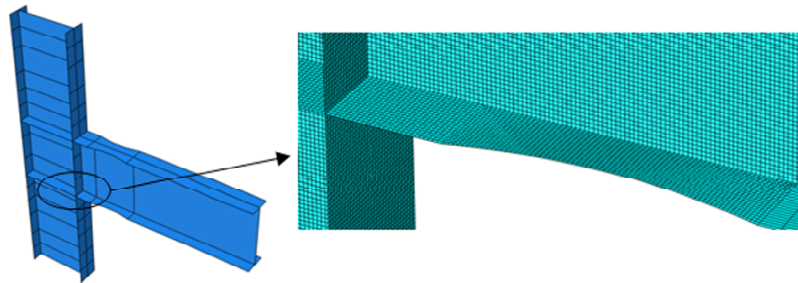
Cantilever model of RBS connection, specimen No. 3, mesh dimensions of 6 mm.
